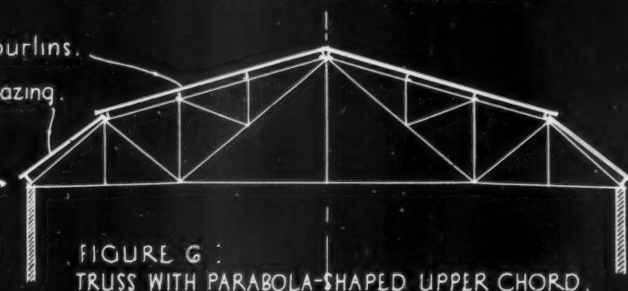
TRUSS WITH PARABOLA-SHAPED UPPER CHORD.
